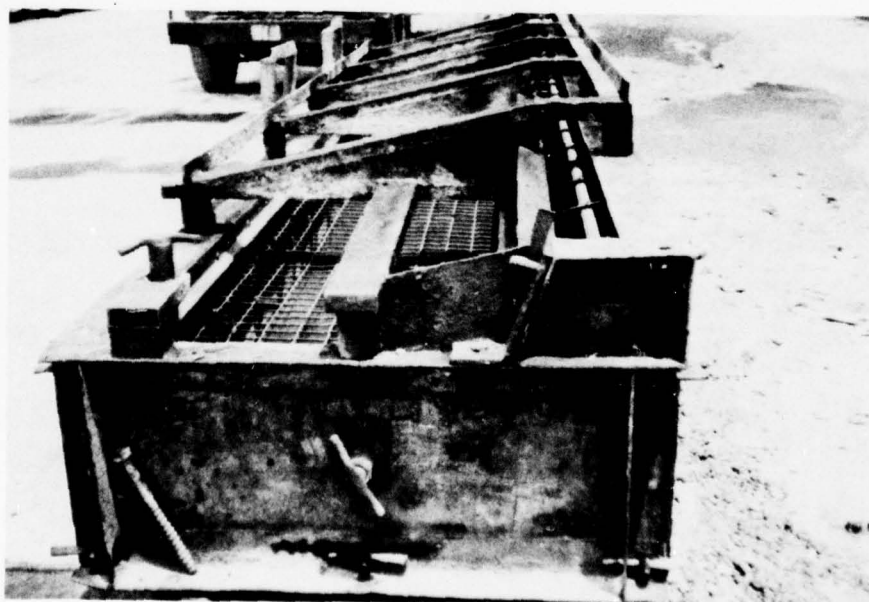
Exterior reinforced concrete girder immediately prior to casting
